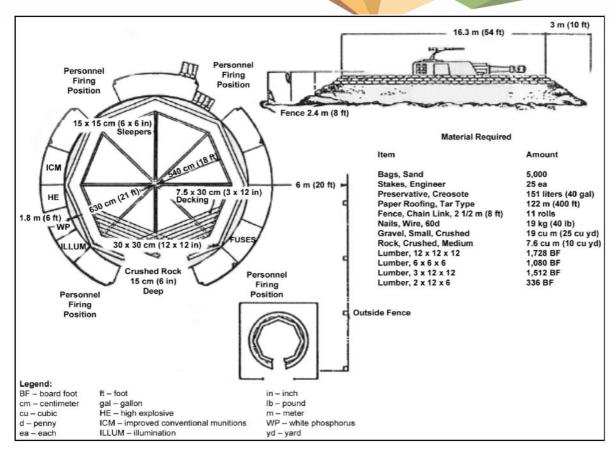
Towed howitzer emplacement (105-millimeter and 155-millimeter howitzer) completed emplacement)
